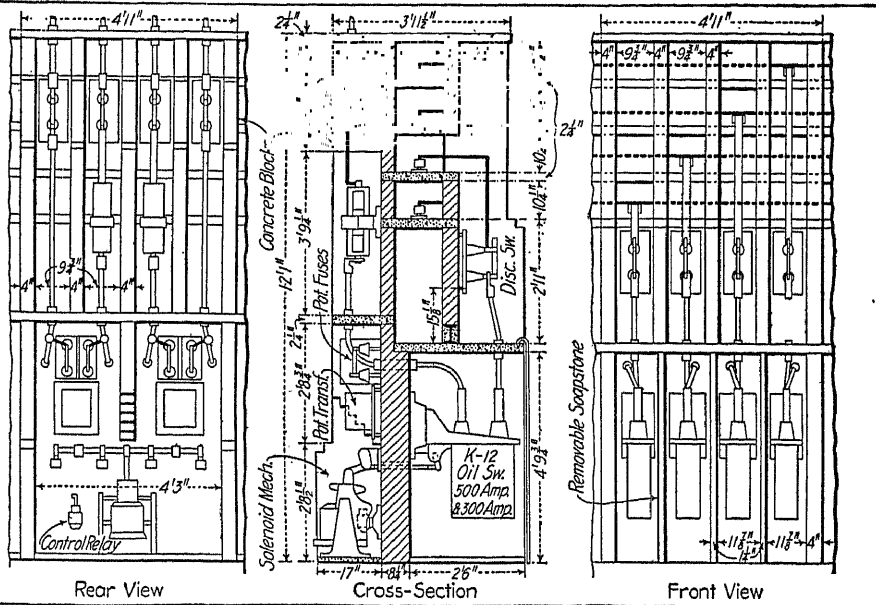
Brick Bus Structure in Substation of Tri-City Railway and Light Co.
